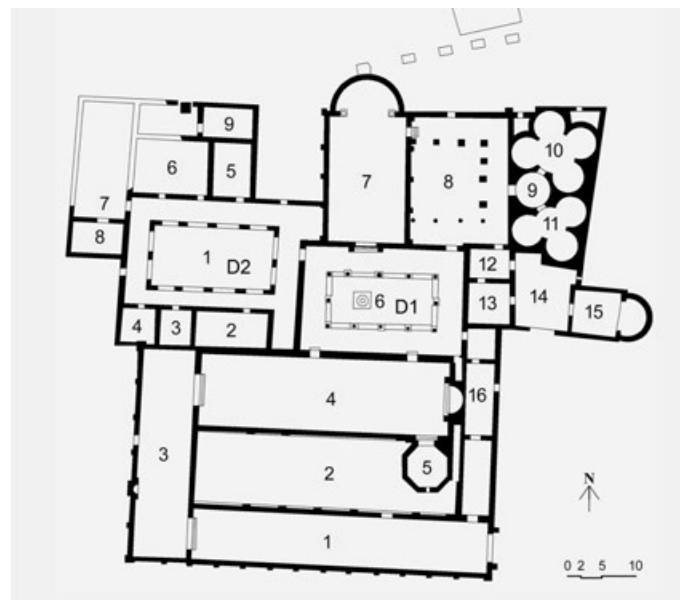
Gamzigrad, plan of palace 1 (according to ČANAK-MEDIĆ / STOJKOVIĆ-PAVELKA 2011, 89 pl. XXXIV).
